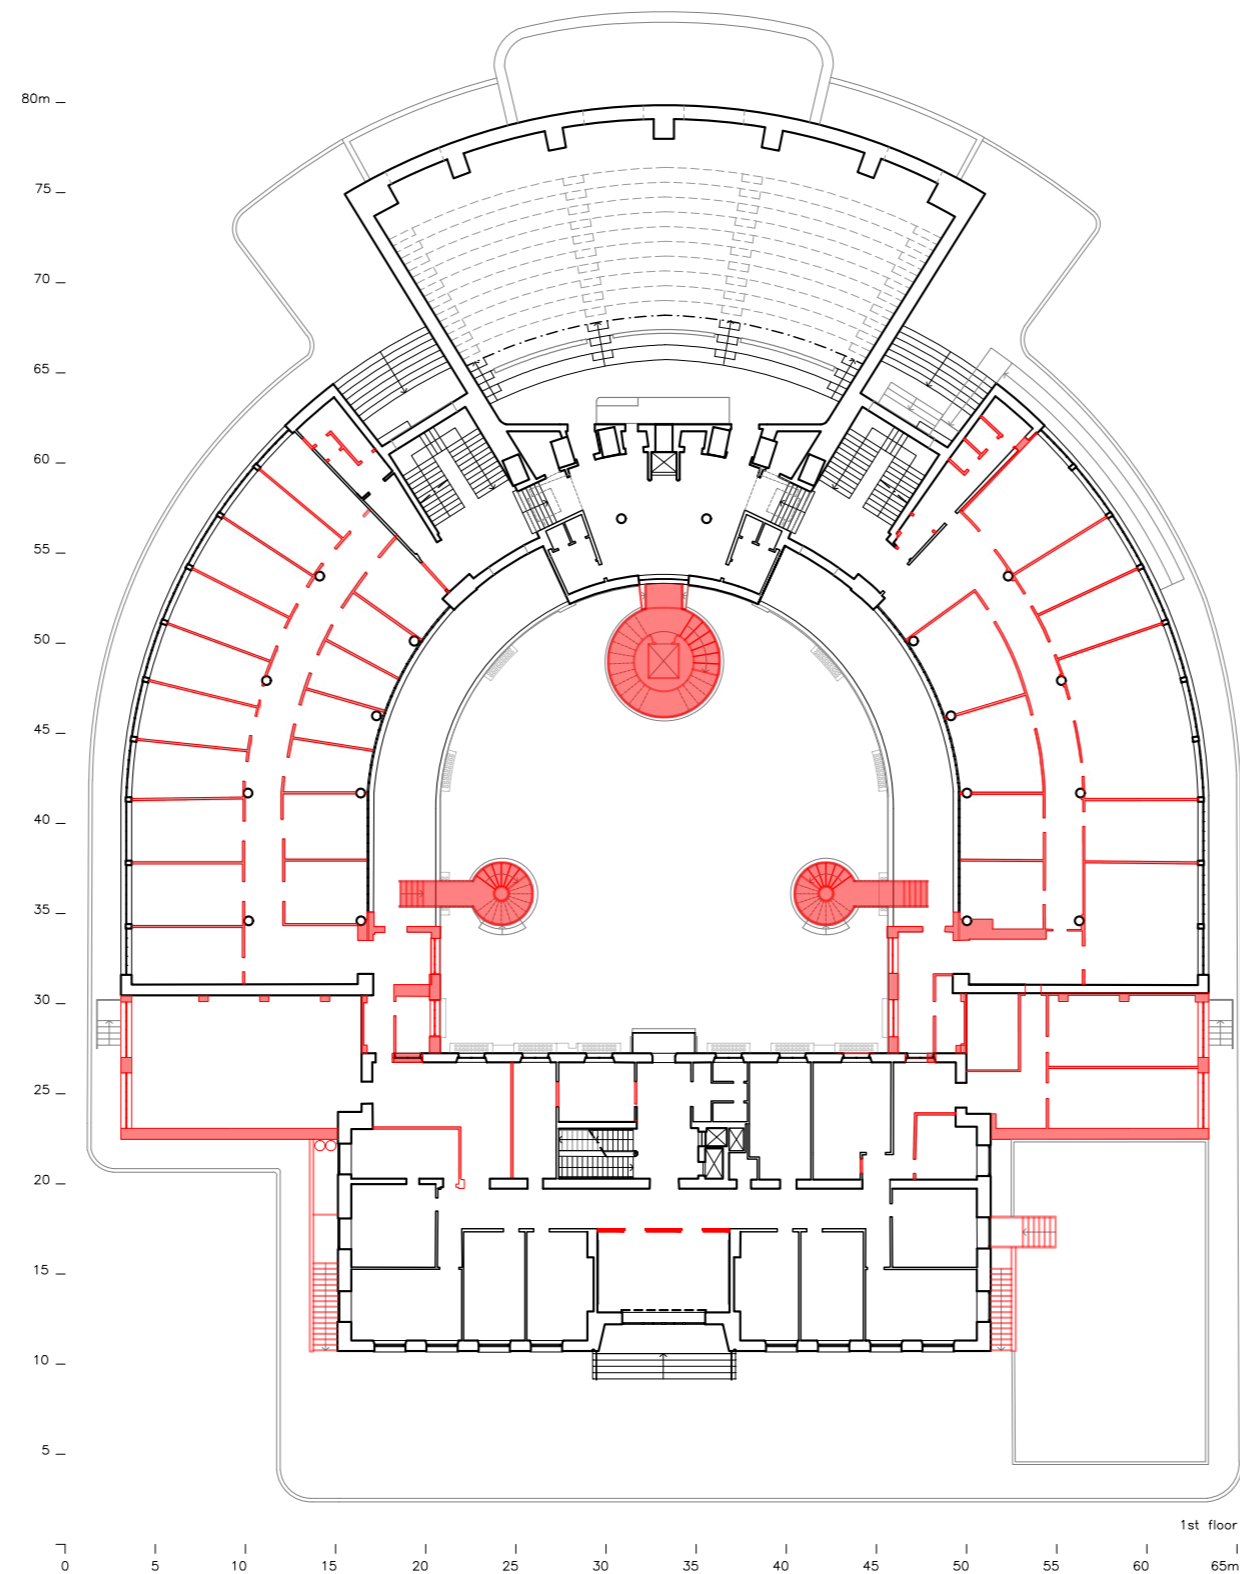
Additions to the building from 1939 to 2021; plan of the first floor (© Cortesi 2020)
